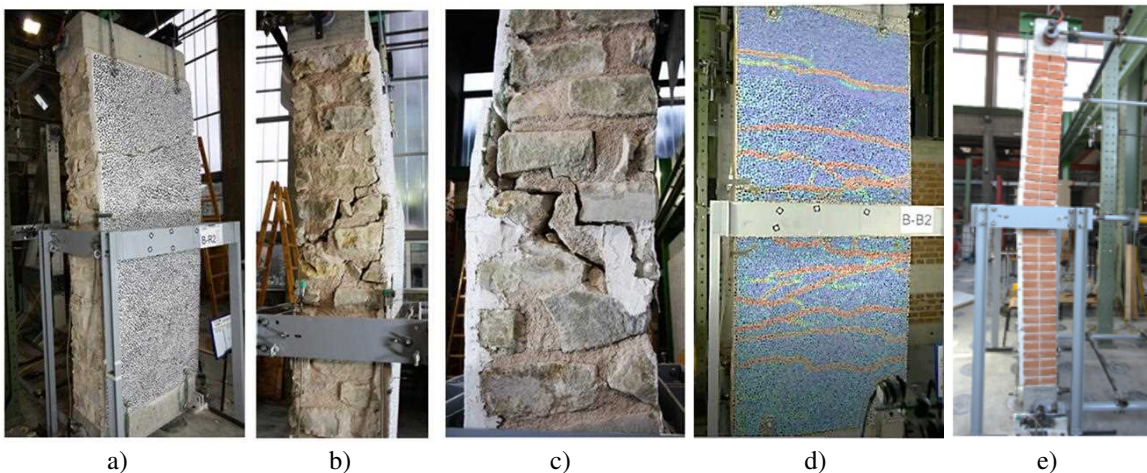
Stone masonry specimen at the end of the bending test on reinforced side (a); detail of the cracks on the specimen (b), (c); brick masonry specimen on the reinforced side (d) and lateral side (e)
